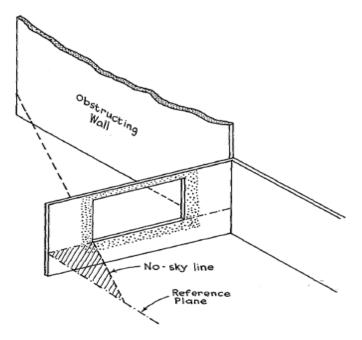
No-sky line for an obstructing wall perpendicular to the Window wall. Source: (Yip, 1972)
